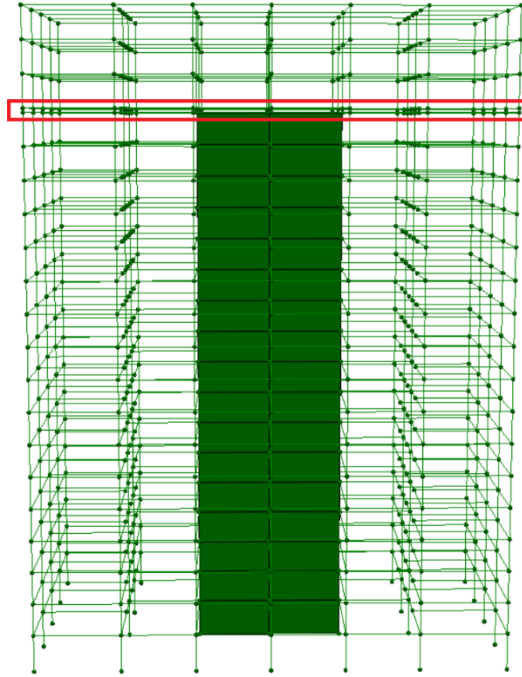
Controlled building with shear wall when isolator at 17th floor
